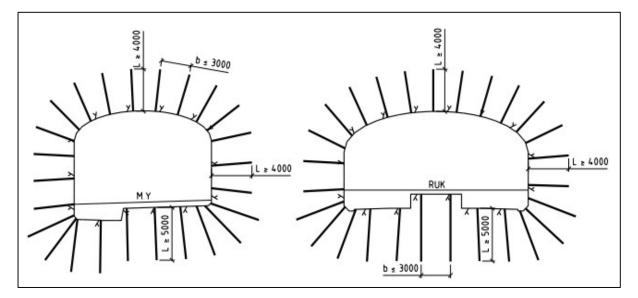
Specific grouting fan for the connection to the main tunnel.
